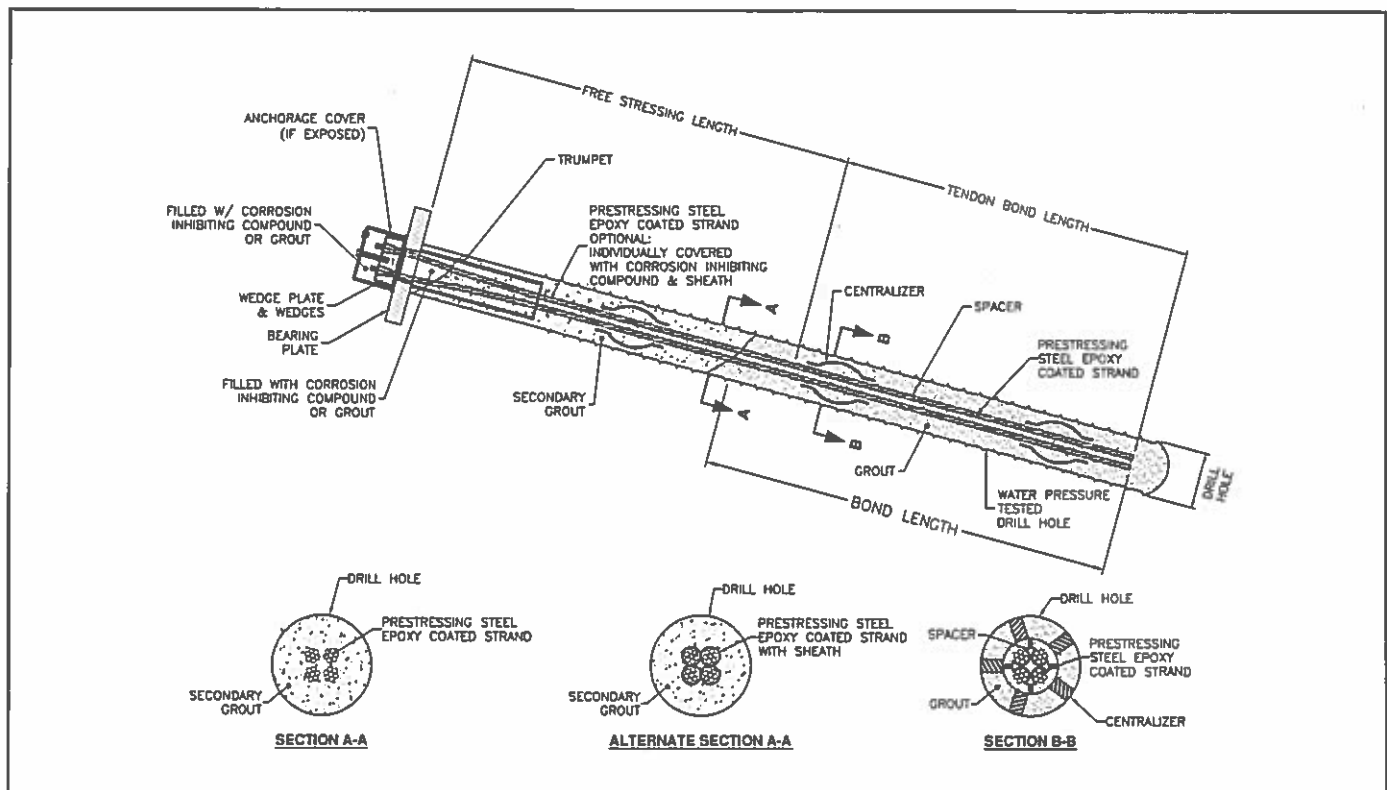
Class I protection: epoxy-coated strand anchor.
